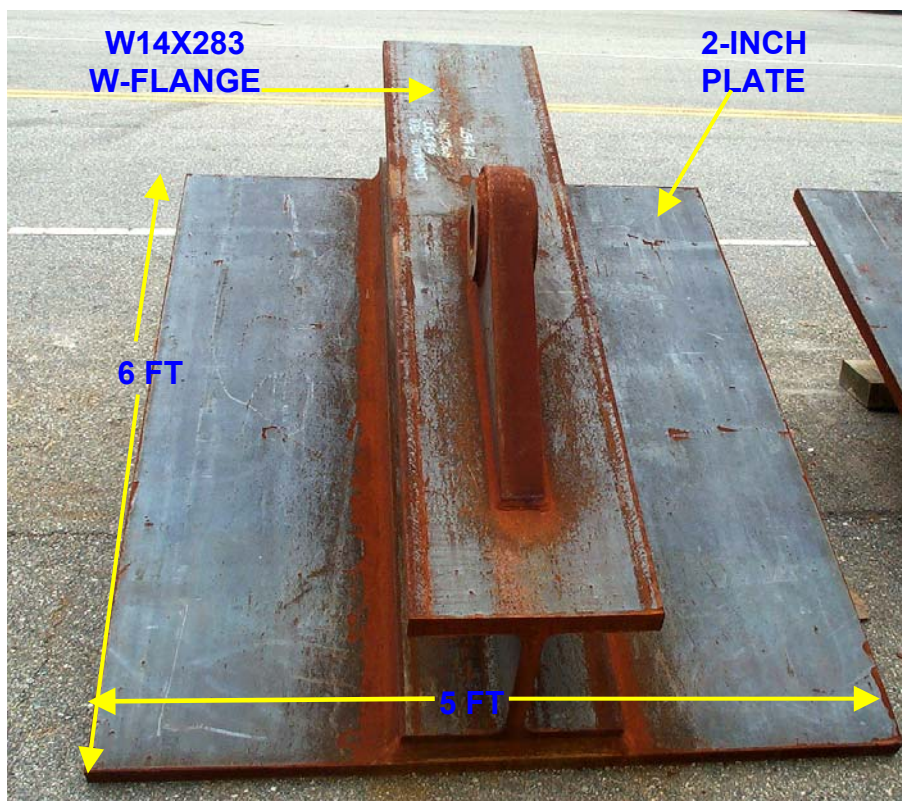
PLATE ANCHOR DIMENSIONS
